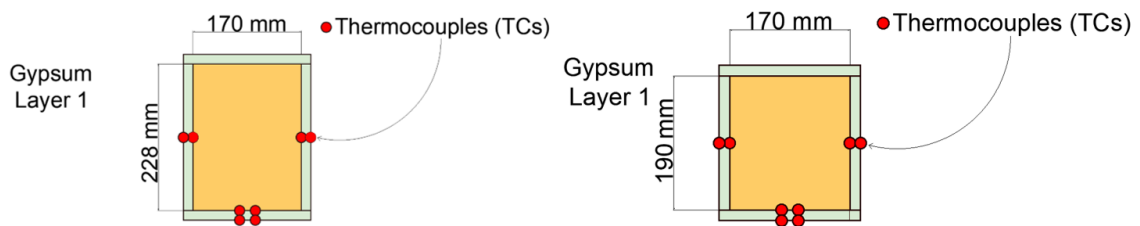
Laboratory encapsulated column thermocouple placement Column 4 (left) and Column 5 (right).
